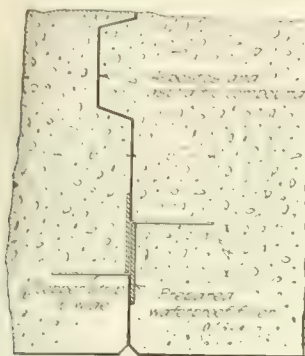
WATER STOP IN WALL EXPANSION JOINTS
